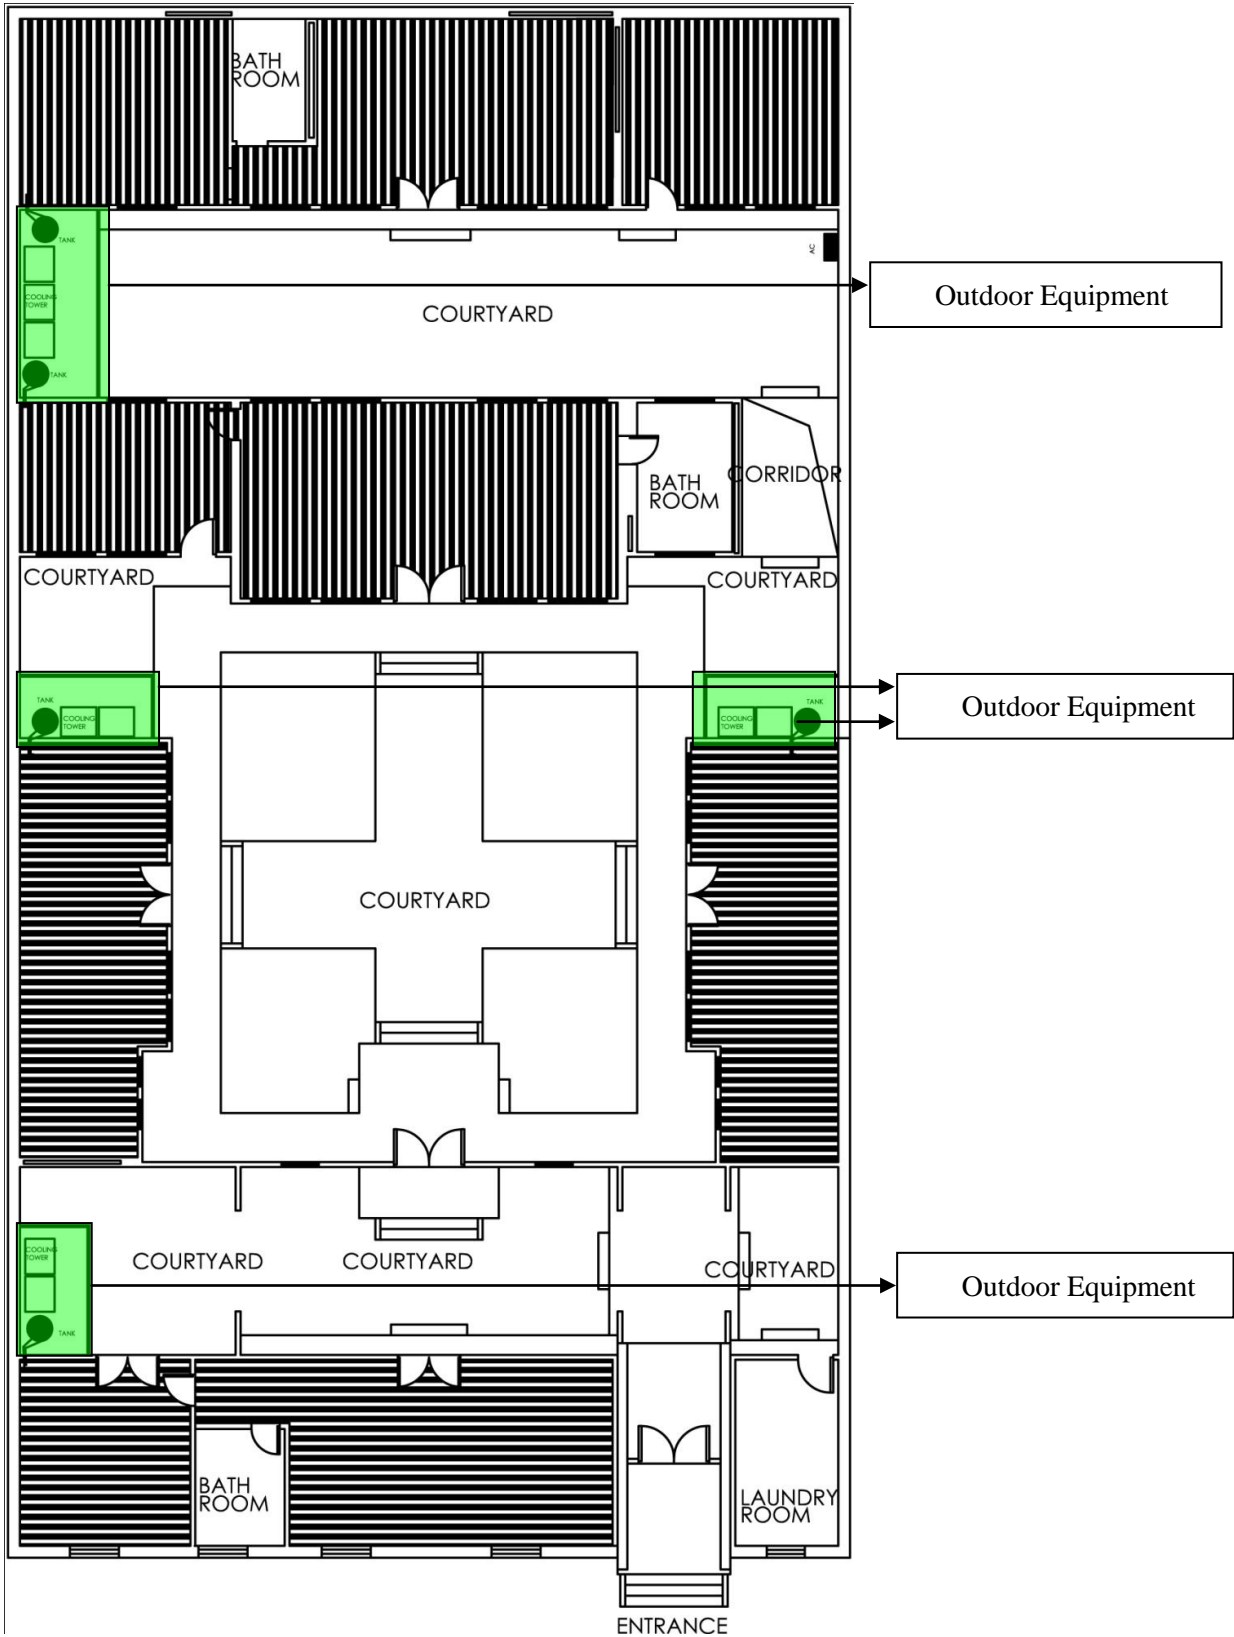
Siheyuan Conceptual Plan for Floor Heating System and Outdoor Equipment
